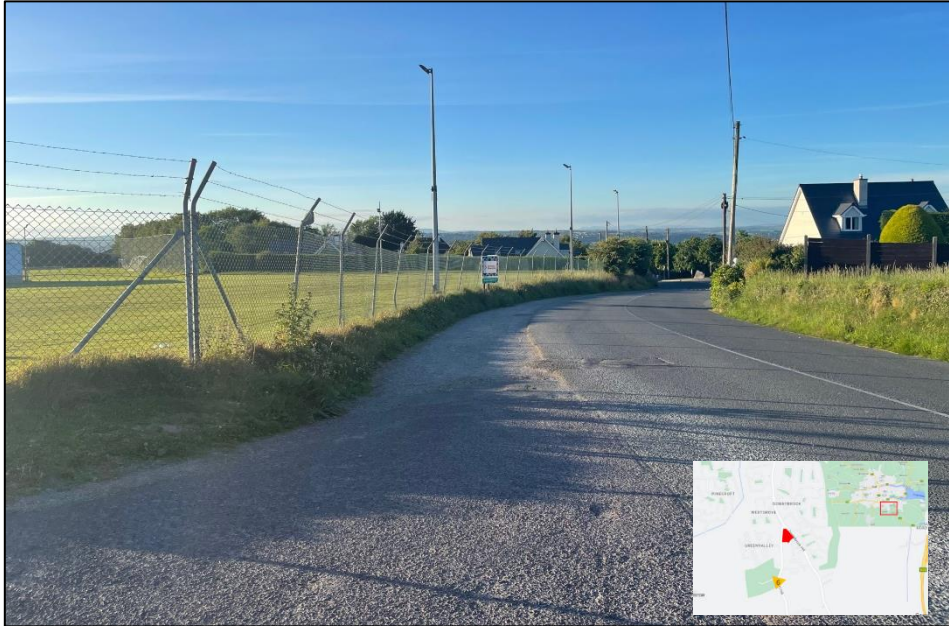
Existing/Proposed view from Corinthians Football Club looking northeast
